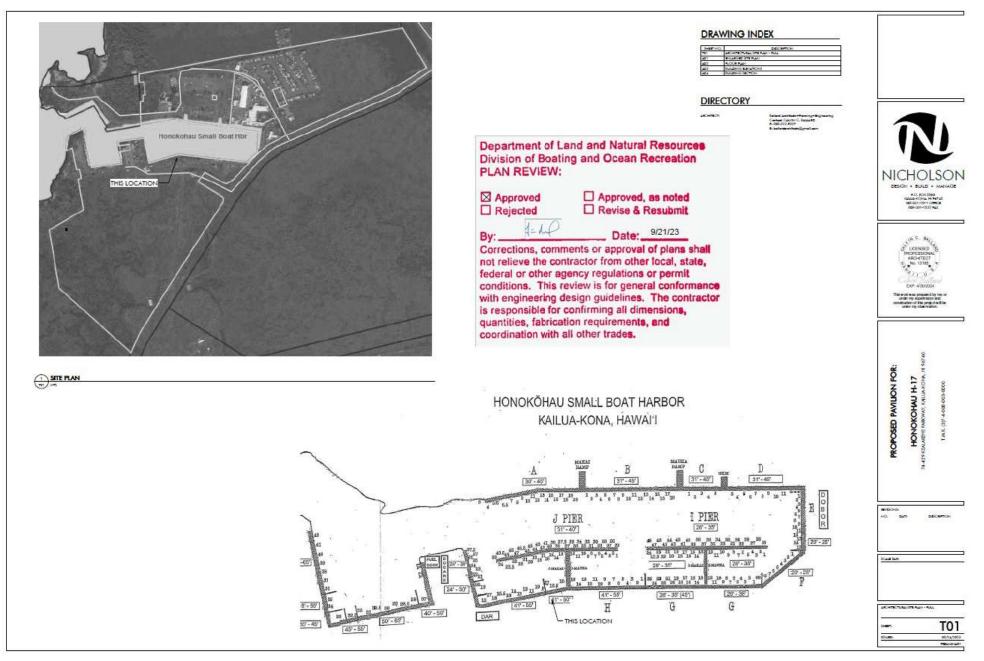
Plans For Pavilion Honokohau Small Boat Harbor
